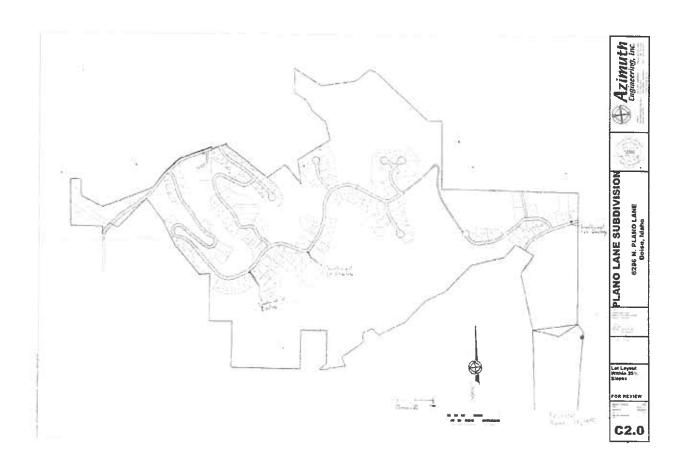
Plano Road Proposal - Building Envelope Placement Within Buildable Area
